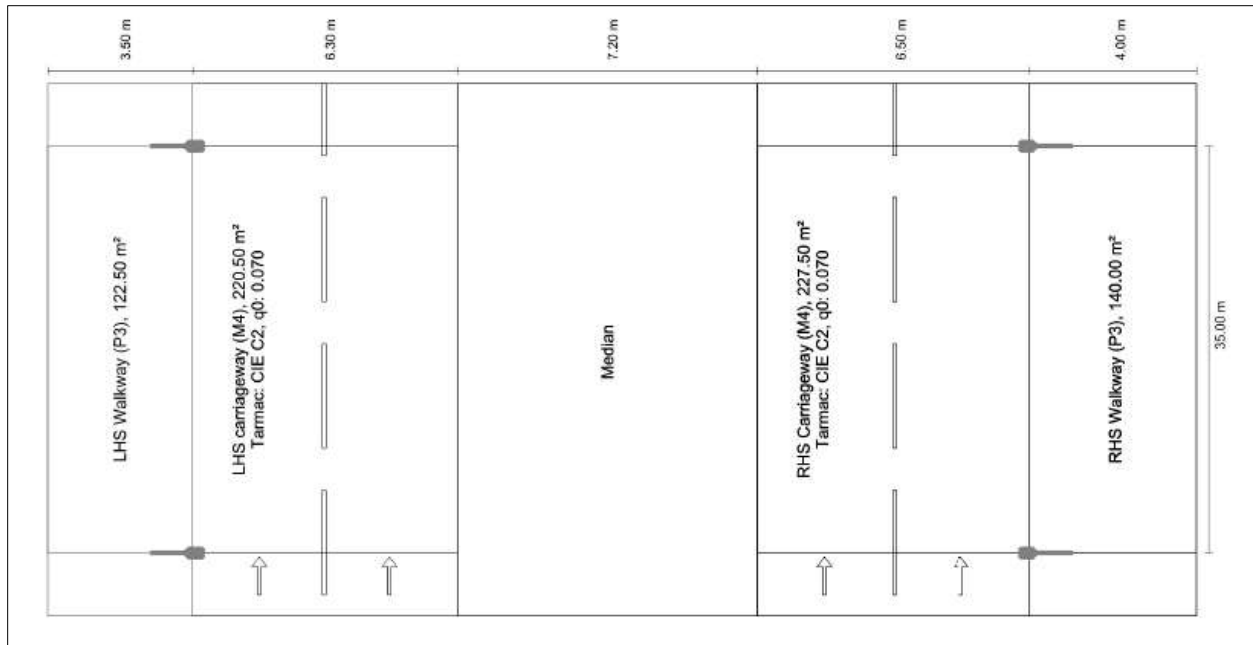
Cross-Section of Uganda Street, 0+800 to 1+000
